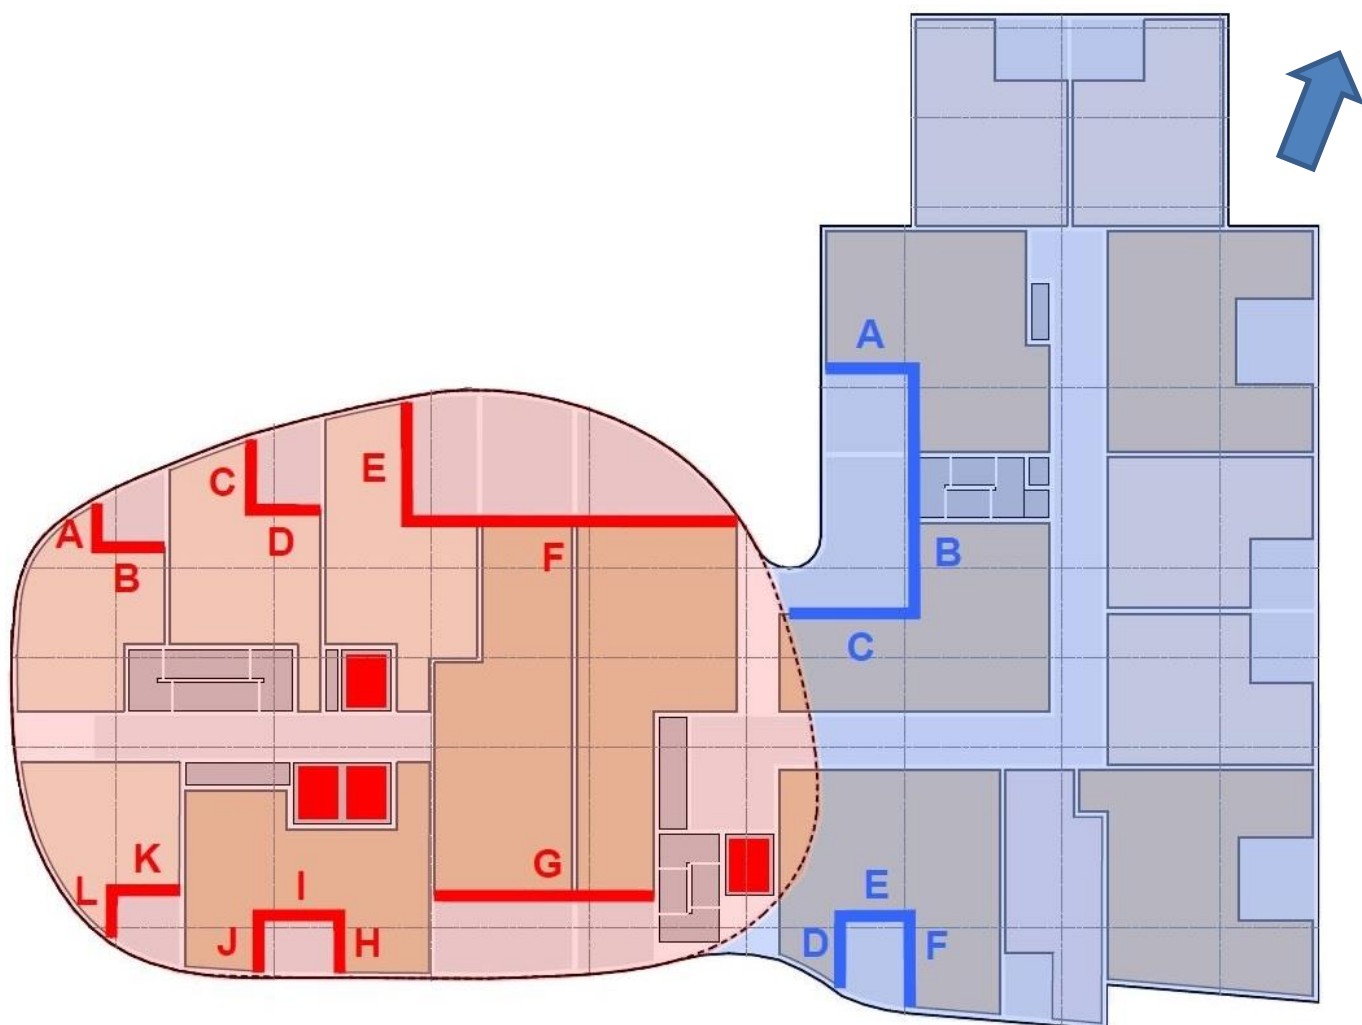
Facade IDs – Building 5 (B05) and Building 6 (B06)
